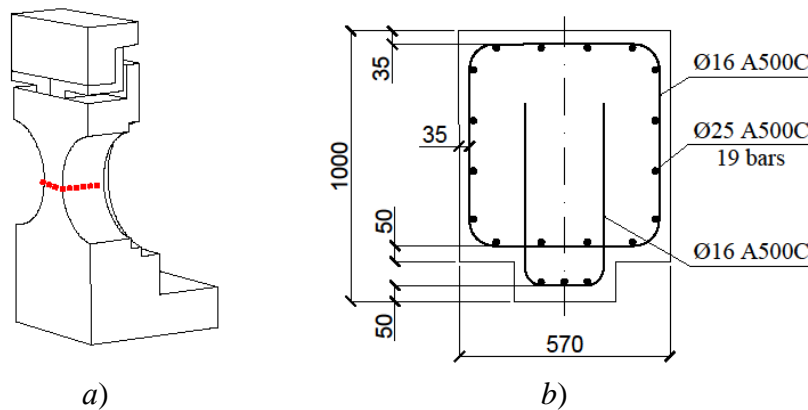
Fragment of a reinforced concrete load-bearing wall of a protective structure:
